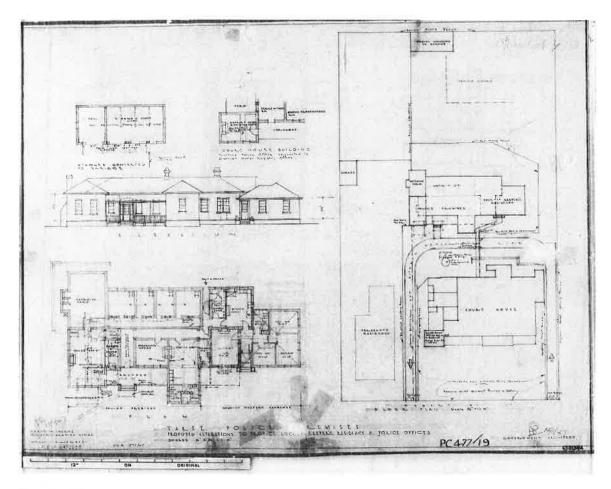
1947 plan showing the proposed alterations and additions to Taree Police Station, with residential quarters on the eastern side of the building and a new driveway for police vehicles running around the courthouse. (Source: Plan Services, Department of Finance)
